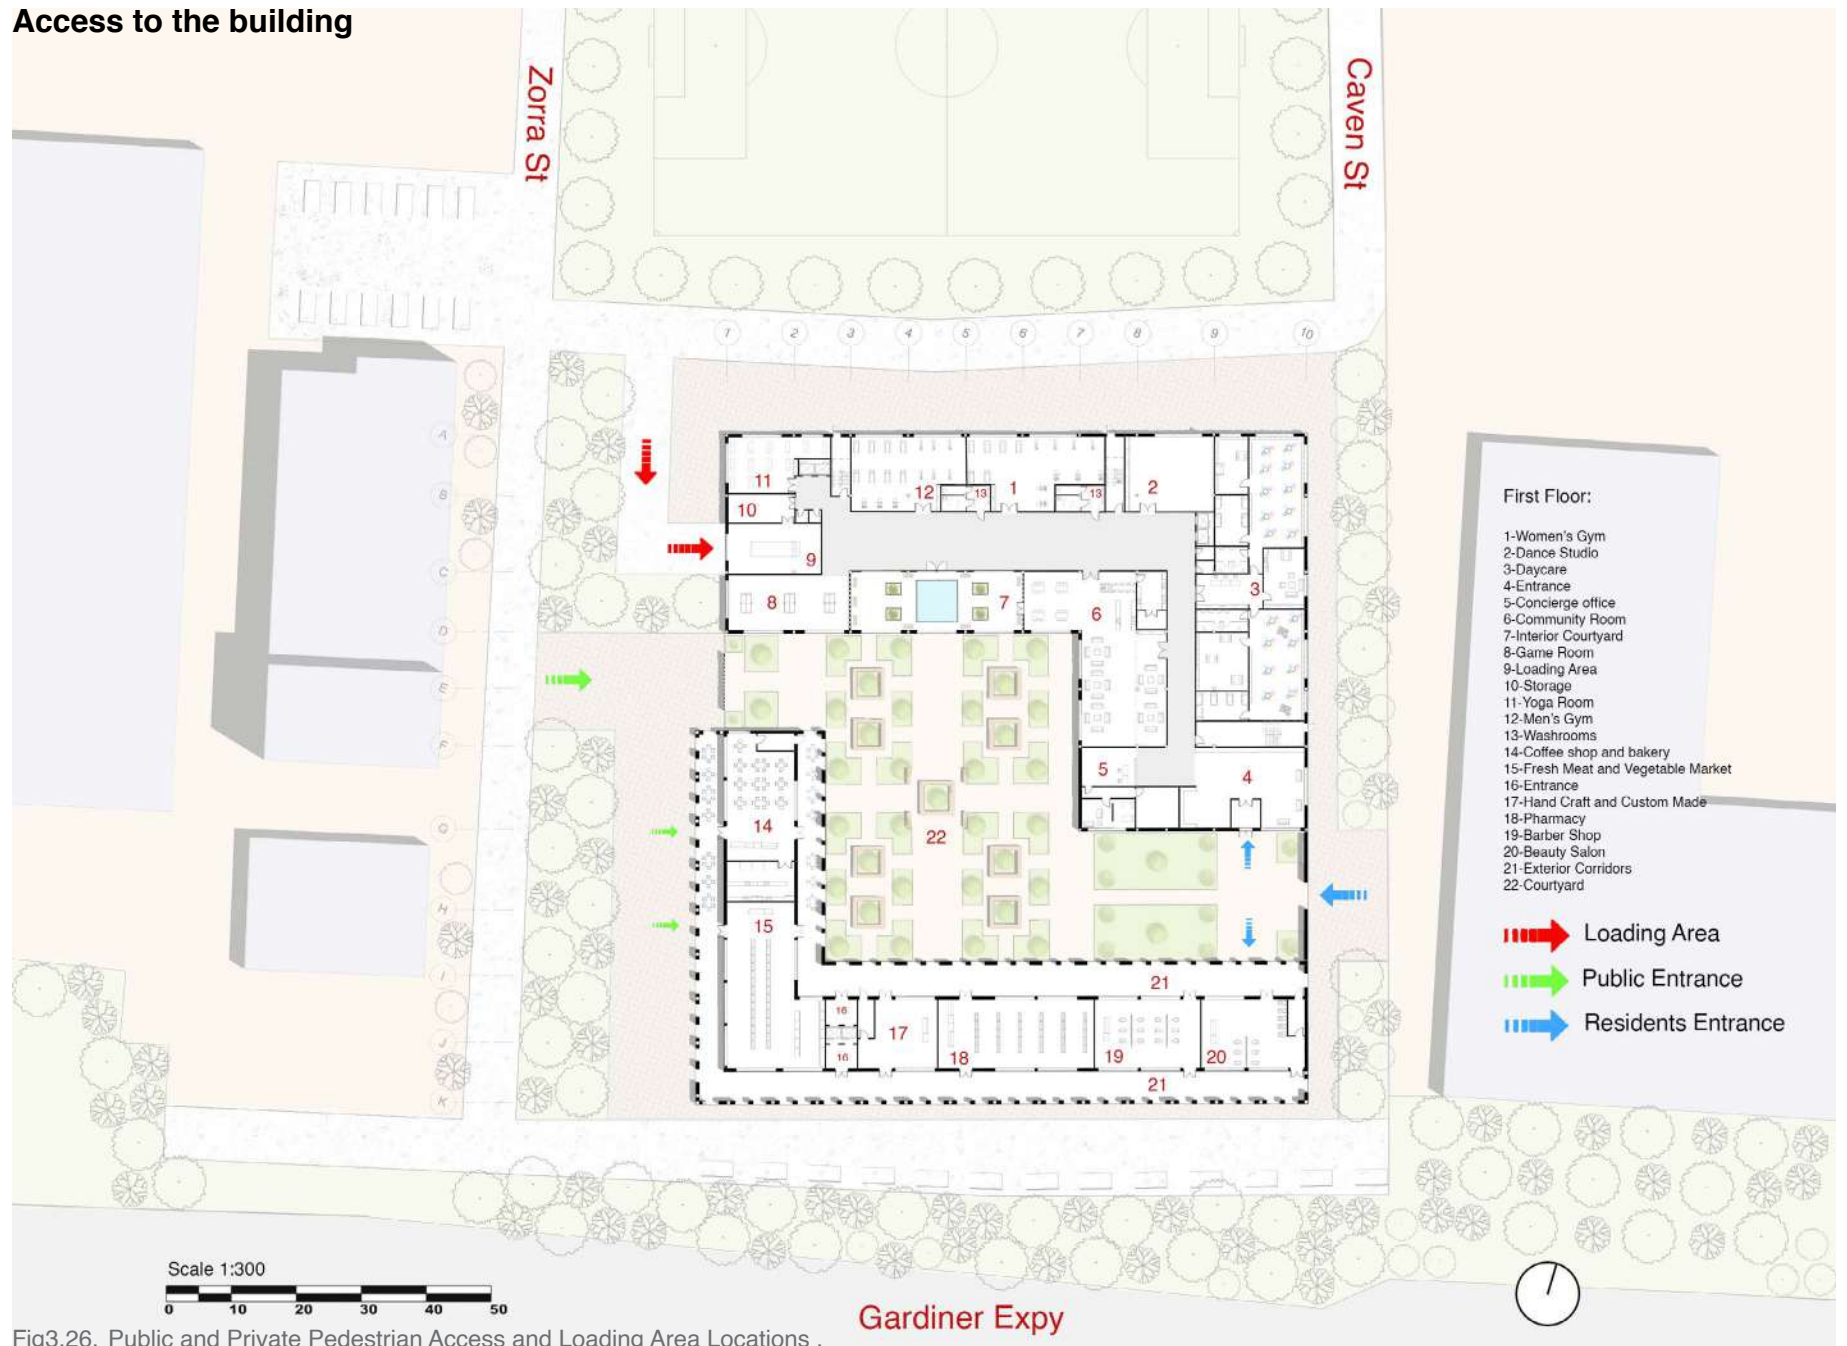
Public and Private Pedestrian Access and Loading Area Locations .
